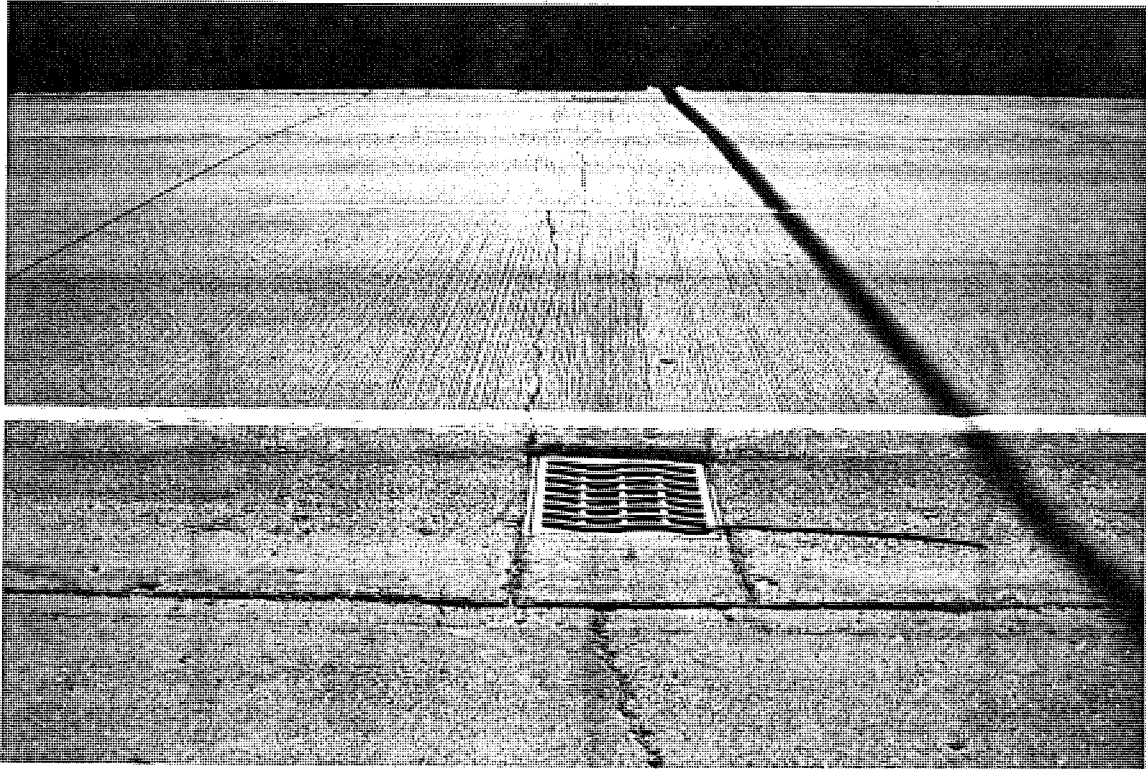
A drainage structure that has induced a full width transverse crack on CSN# 25132-06582A SB.
